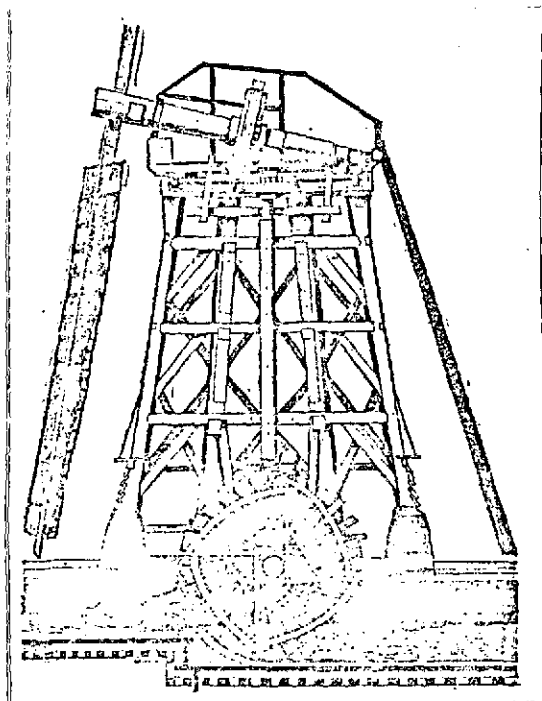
Framework of an old windmill with rotating head, drawing water by means of a paddle wheel.
